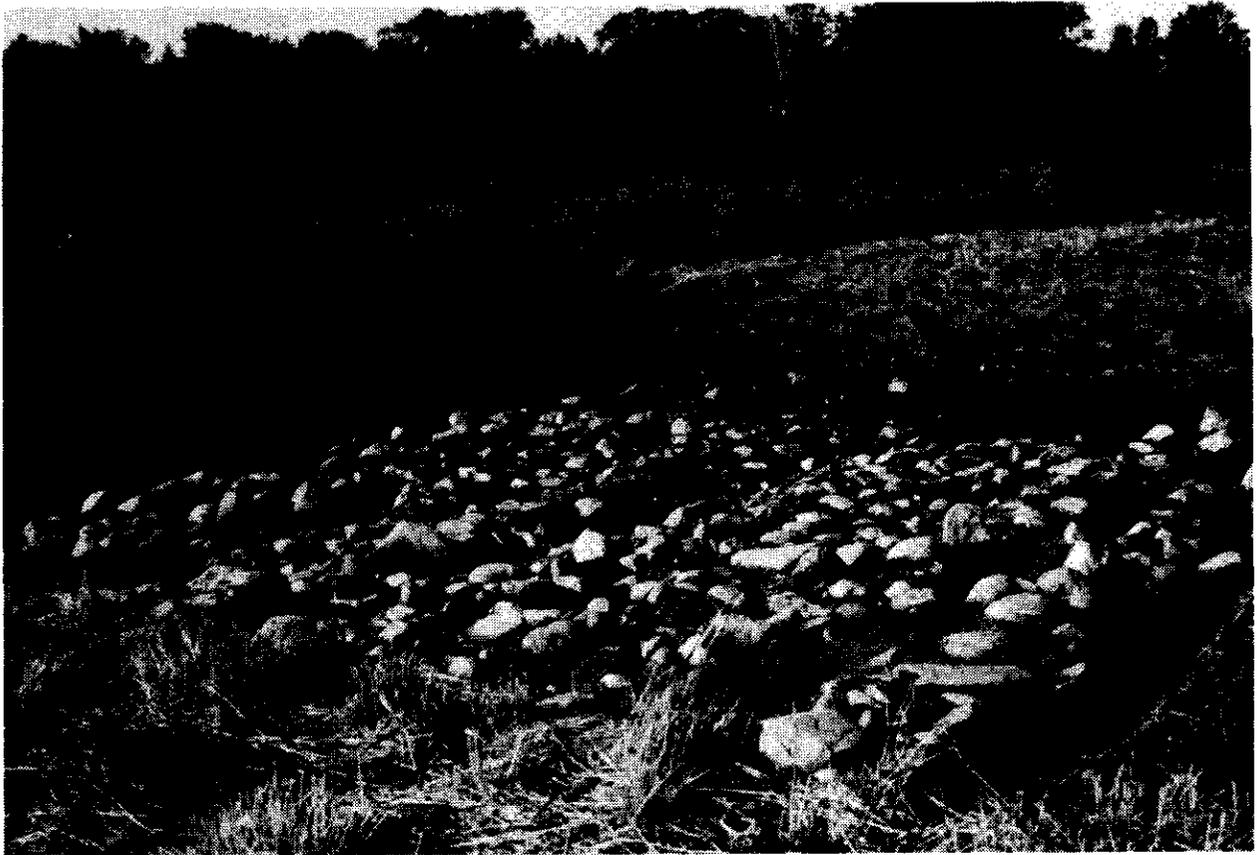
View to the southwest across an exposed section of a stone roadbed in the swamp west of the North Bridge. This roadbed was probably constructed between 1635 and 1650, and was abandoned in 1750 or '51 when an improved causeway was built alongside it on the north (Abel 1965:Plate 7).
